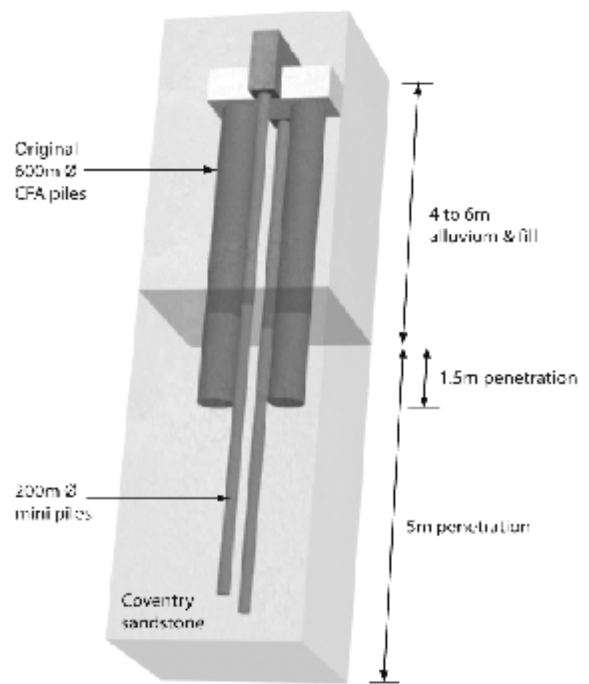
Isometric view of 2 cap group supplemented by mini piles & further pile caps
